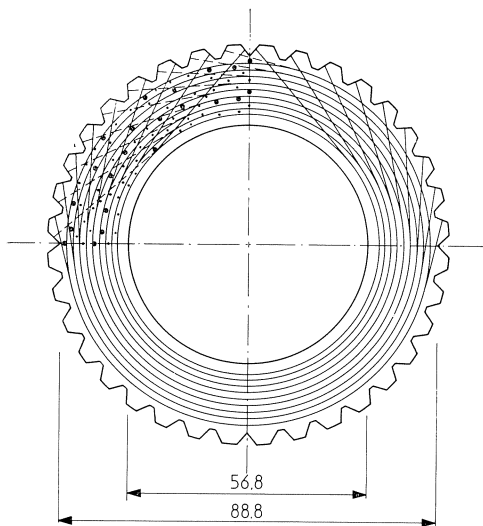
Horizontal section through pressure vessel at bottom or top slab: prestressing steel.
